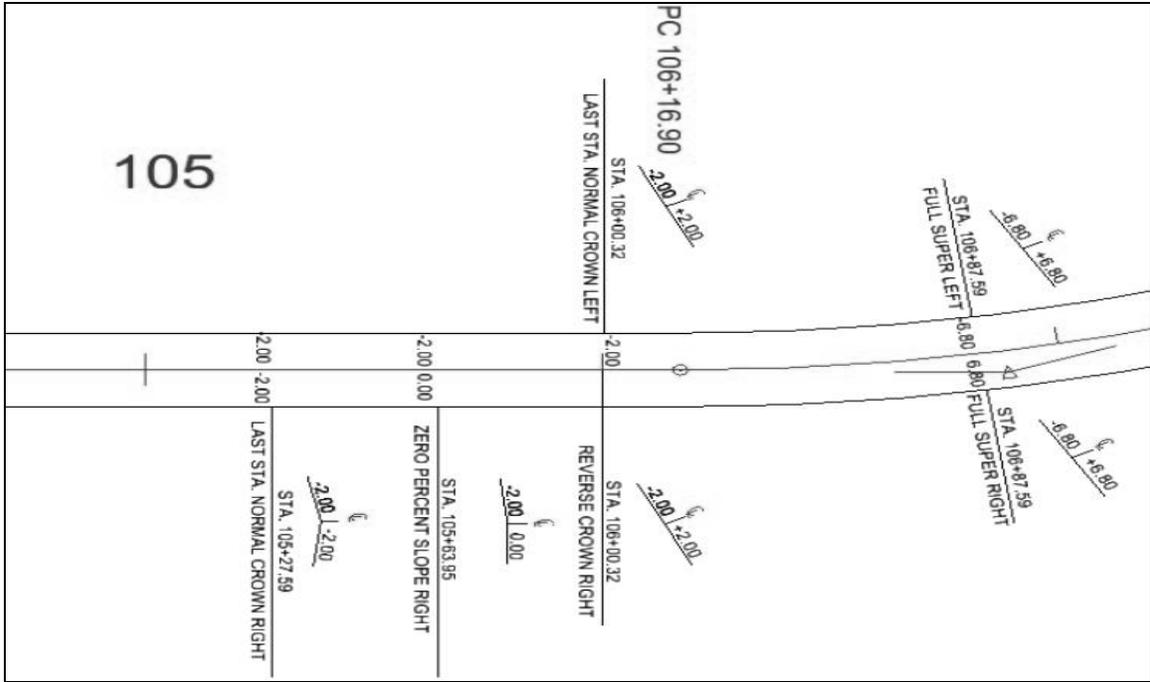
STATIONS AND CROSS SLOPES BEFORE FULL SUPERELEVATION
